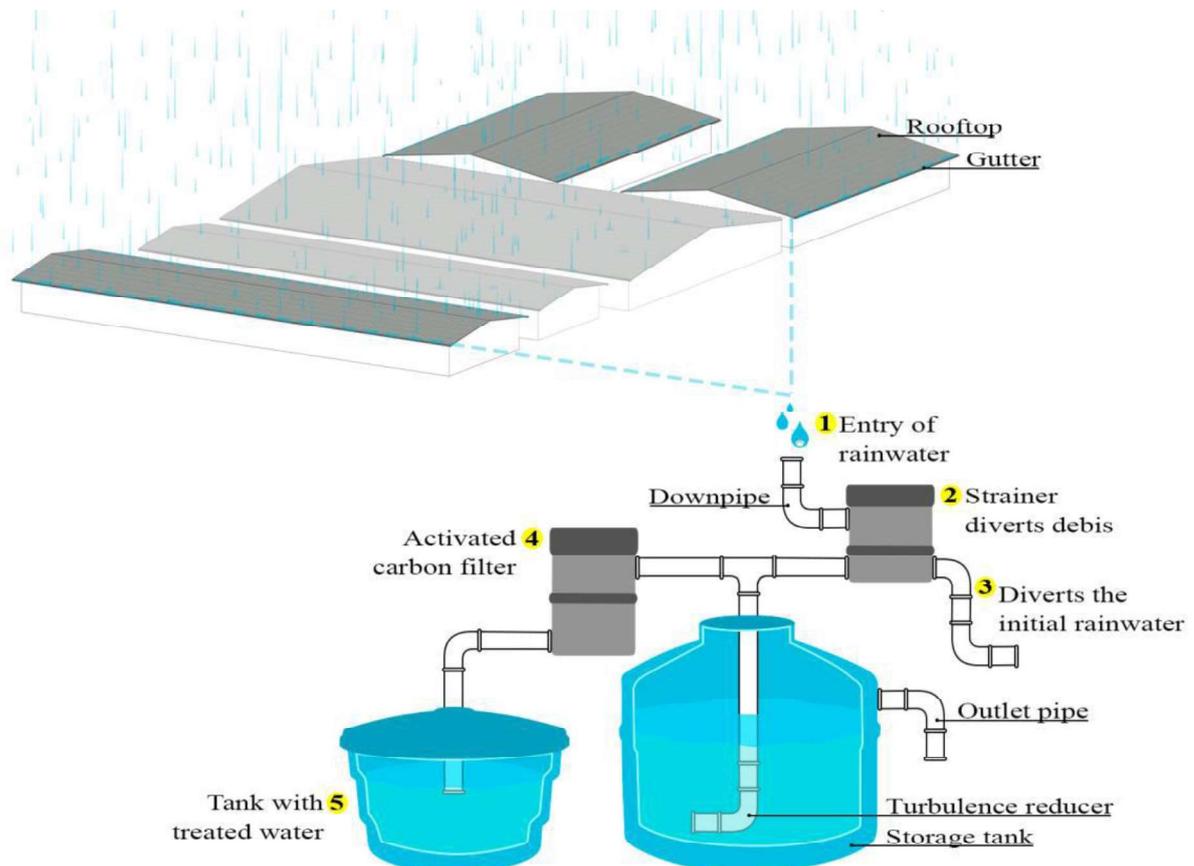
Schematic representation of the roof area and the rainwater collection system used for rainwater collection at the Tubarão prison complex
